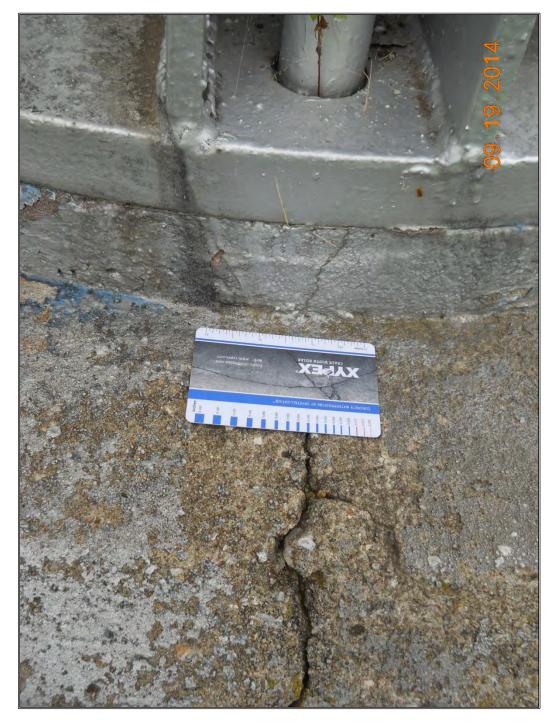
Close up View of 0.05inch wide Crack with Spalling in Footing.
